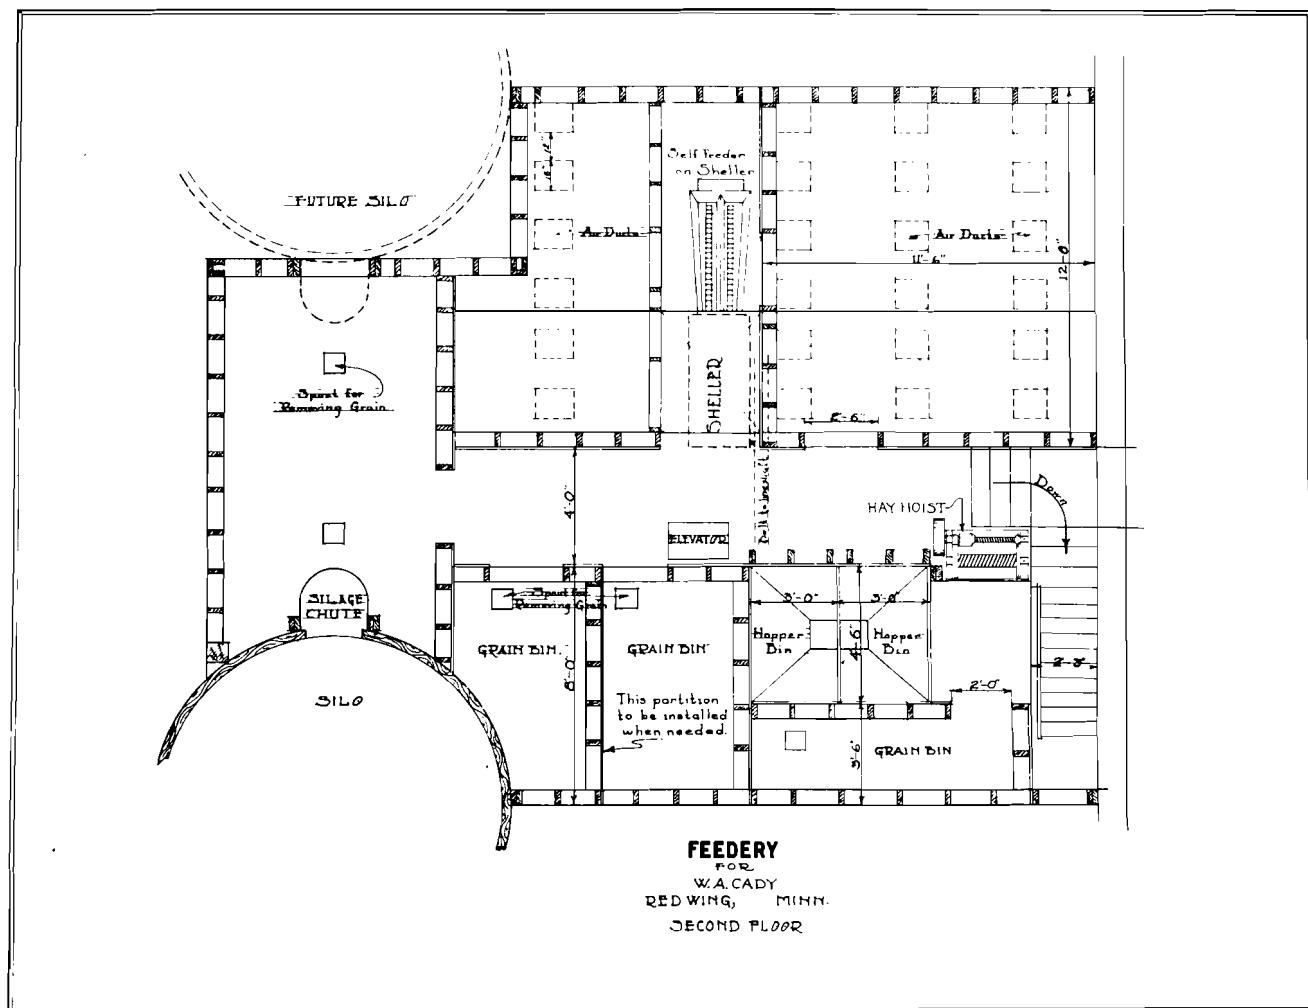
Second floor plan of feedery. Note location of hopper bins, hay hoist, corn sheller, and air duct openings for drying corn.
